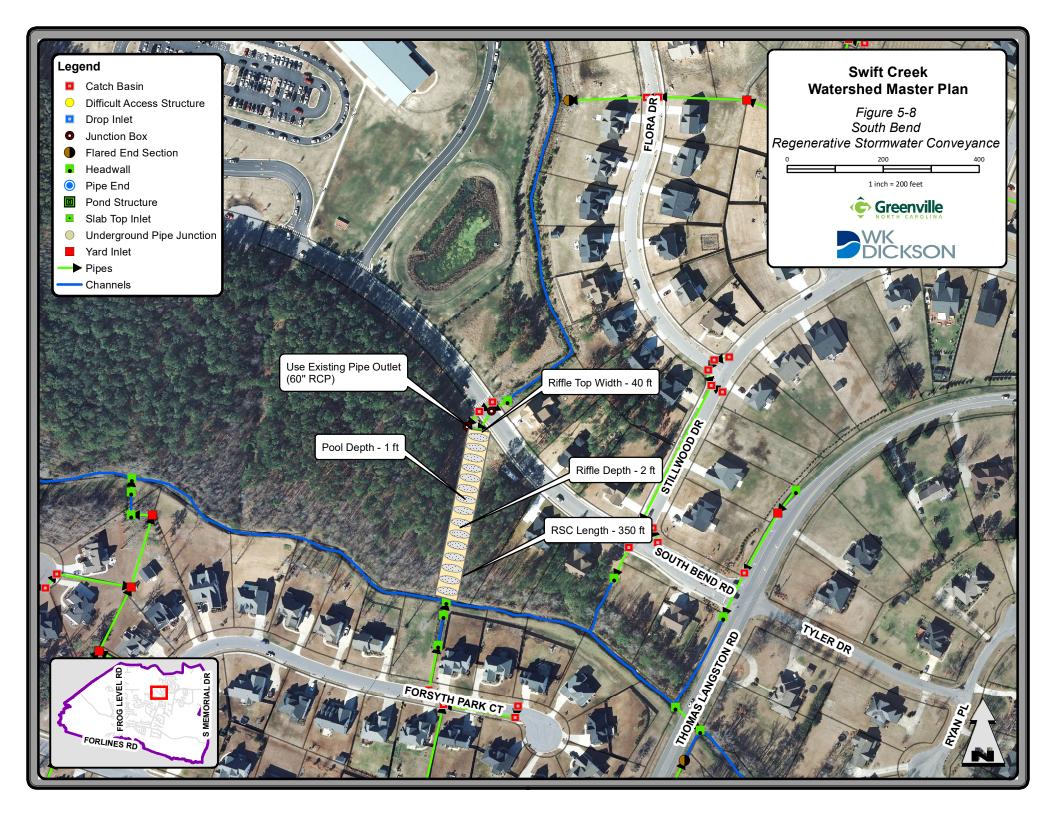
Proposed Location for South Bend Regenerative Stormwater Conveyance
